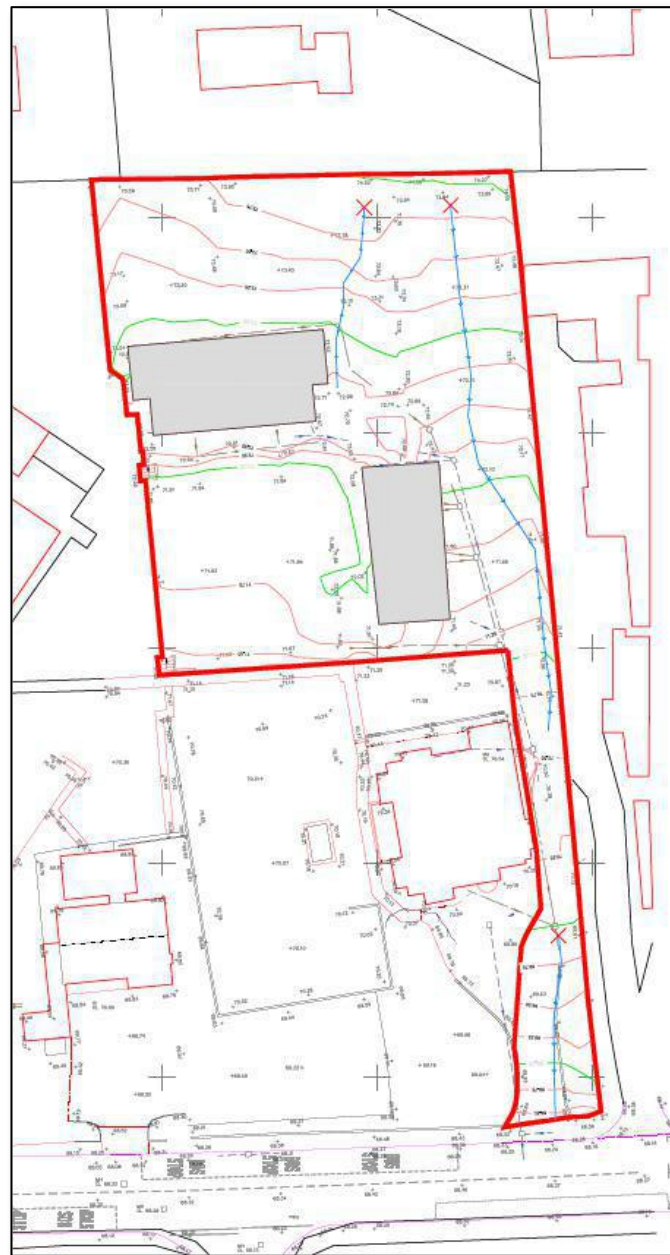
Extract of Appendix 1, Plan 4 – Existing Surface Water Flow Pathways.
